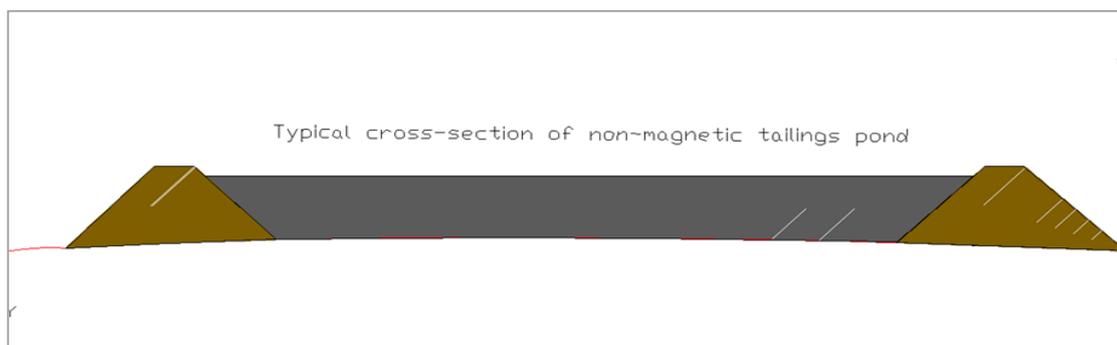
Typical Cross-Section of the Non-Magnetic Tailings Pond
